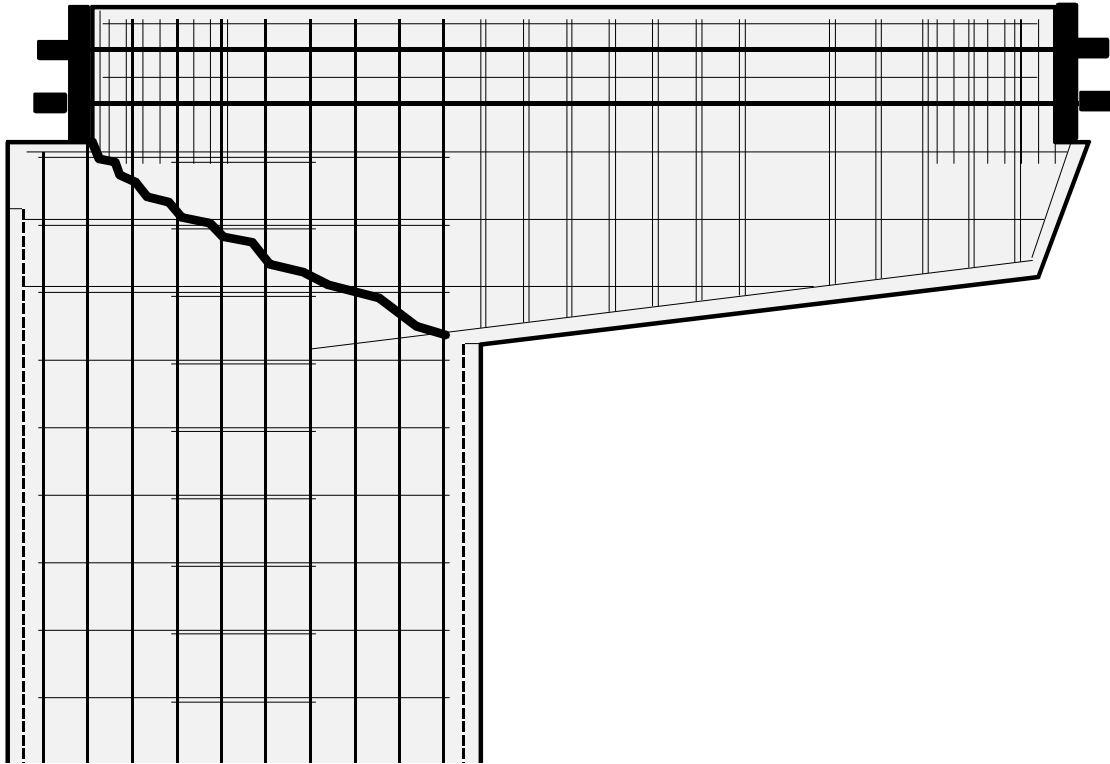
Crack at Critical Section in Bent with Post-Tensioned Overhang [Modified from Ref. 3]
